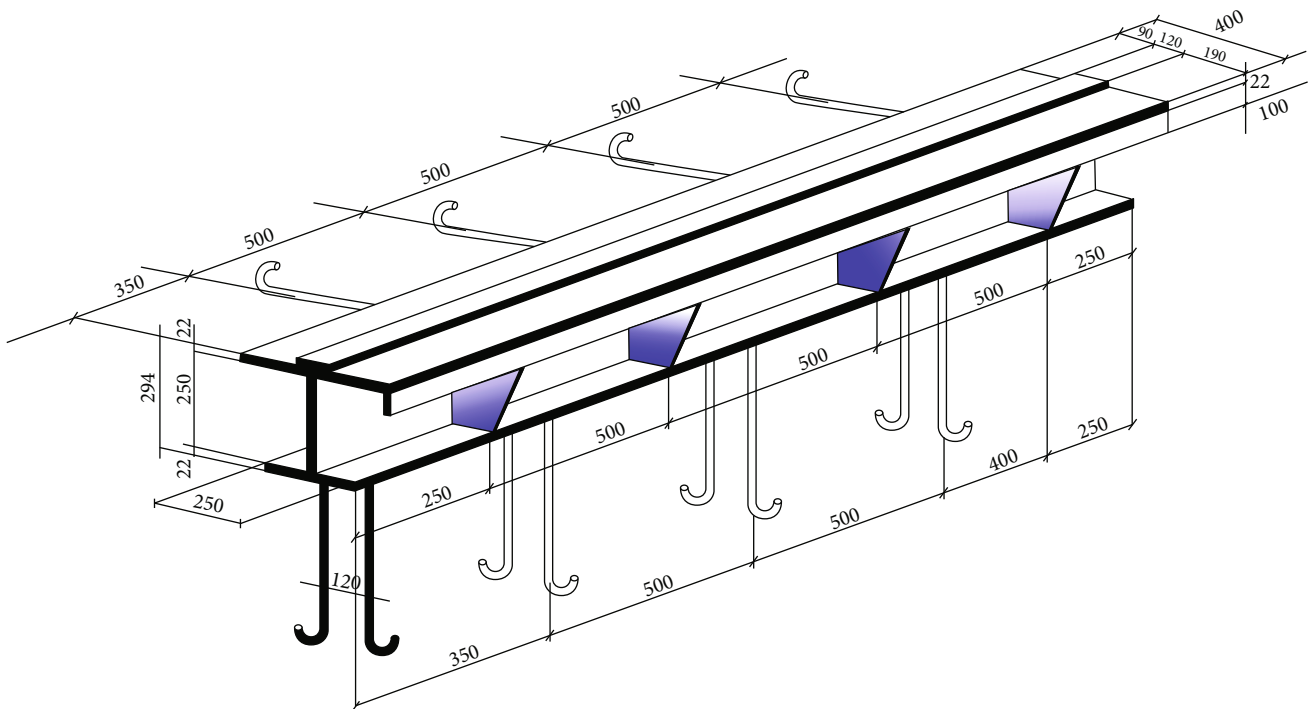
Steel profiles, plates, and anchoring dimensions (for a 2 m long piece).
